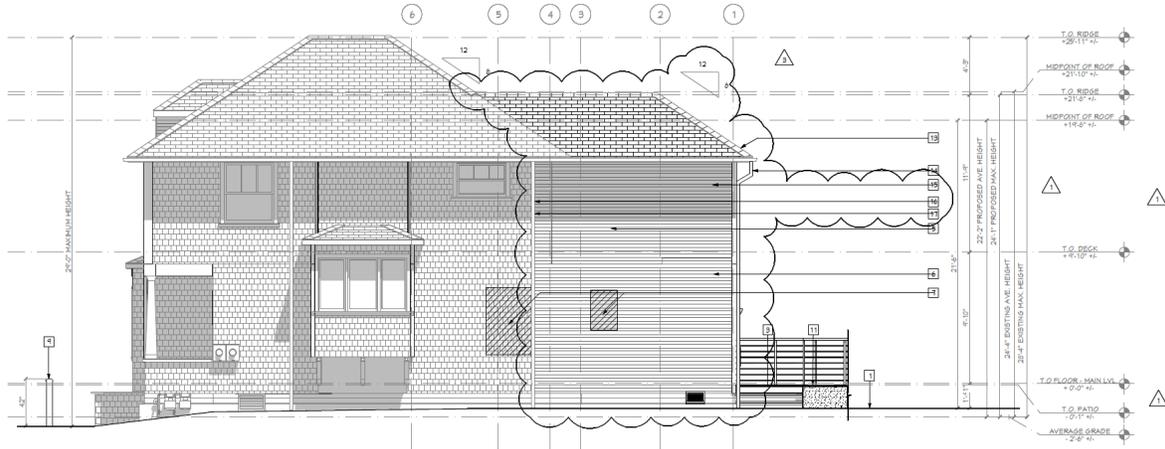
East Elevation (not to scale) – Approved in 2024, #B2024-02185
